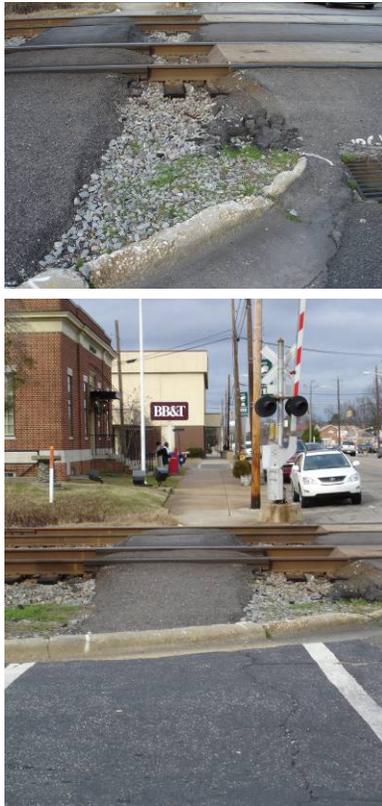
Existing Railroad Crossing Example in downtown Dunn. *Poor pavement condition (top) and poor design complicate crossings here. Design issues include placing the gate in front of (instead of behind) the sidewalk, constructing the ADA ramp, and extending the concrete pads across the sidewalk path would have been low-cost and a better long-term maintenance solution.
